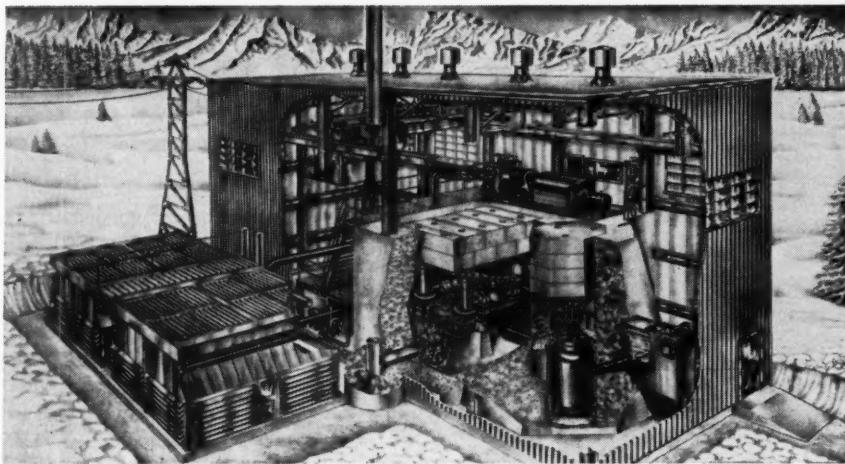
Type of building planned to house Army Corps of Engineers package power reactor
